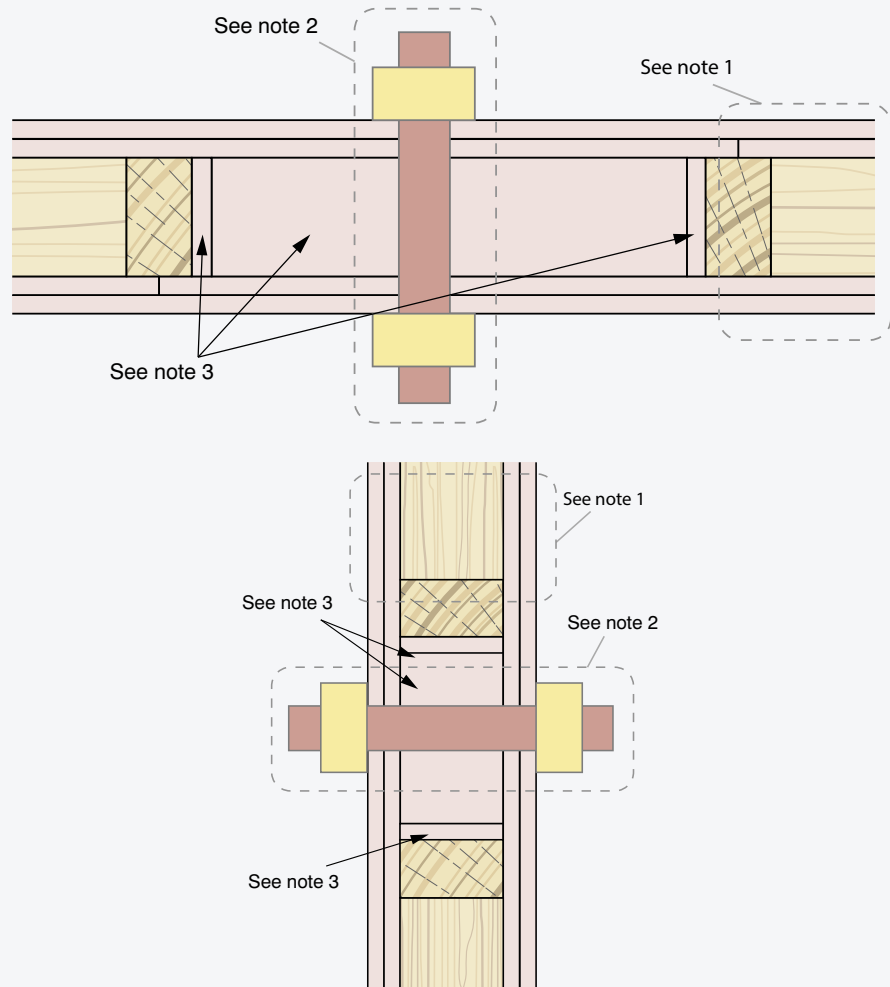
Plastic pipe penetration through fire-protected timber-framed walls with internal linings.
